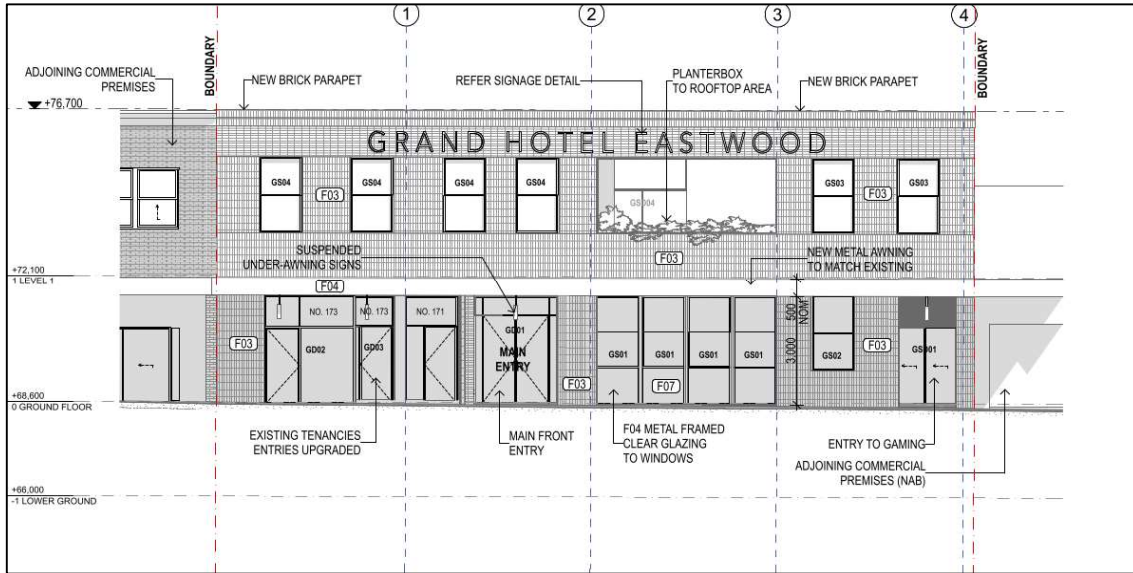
Proposed Southern Elevation (Rowe Street) and Signage
